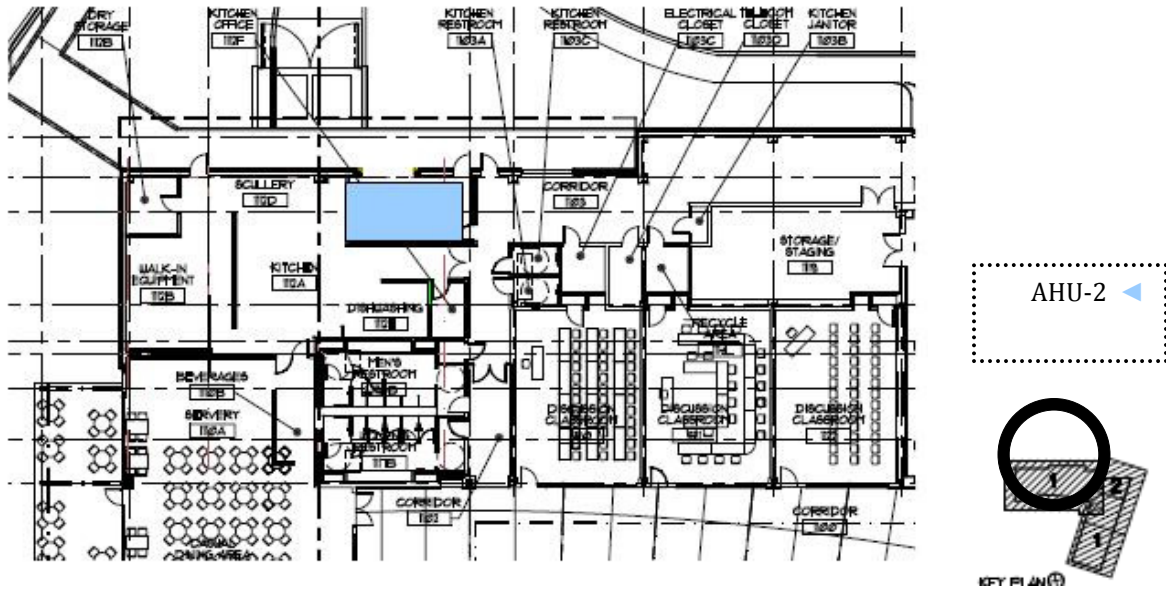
ROOFTOP MECHANICAL EQUIPMENT LAYOUT
